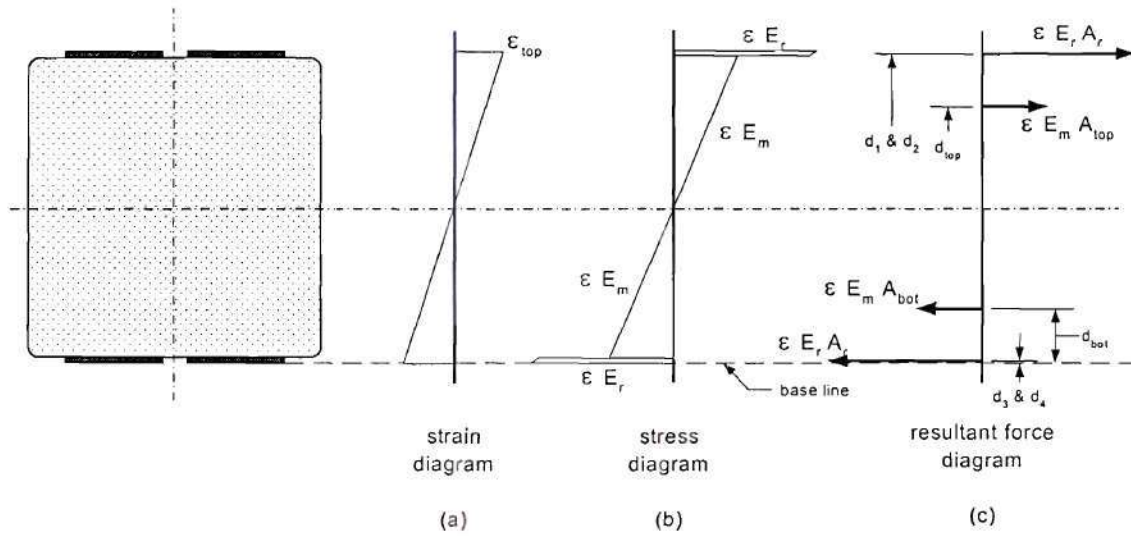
Cross section of the RP specimen with 4 - 1/2-inch wide reinforcing straps
